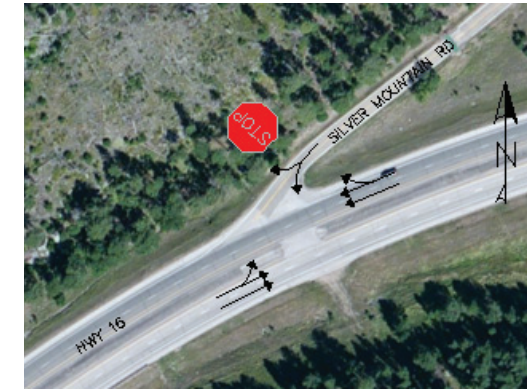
Highway 16 & Silver Mountain Road Intersection Configuration
